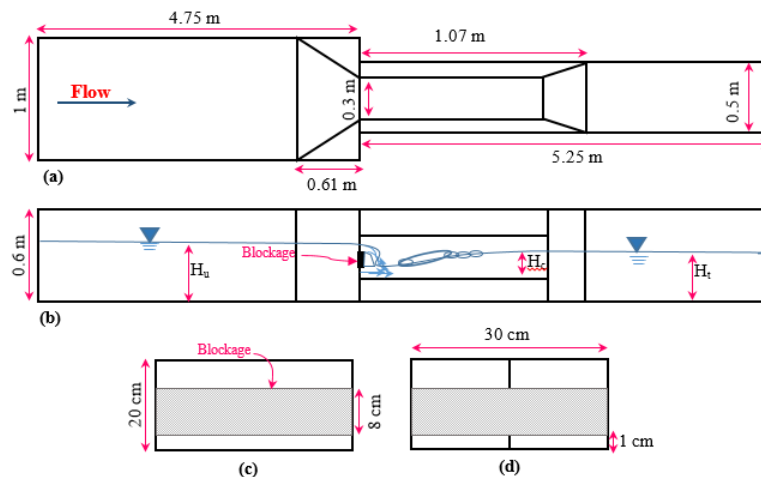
Culver model: (a) Plan view of flume and culvert, (b) Longitudinal profile, (c) One barrel culvert inlet with 40% blockage and (d) Two barrel culvert inlet with 40% blockage.
